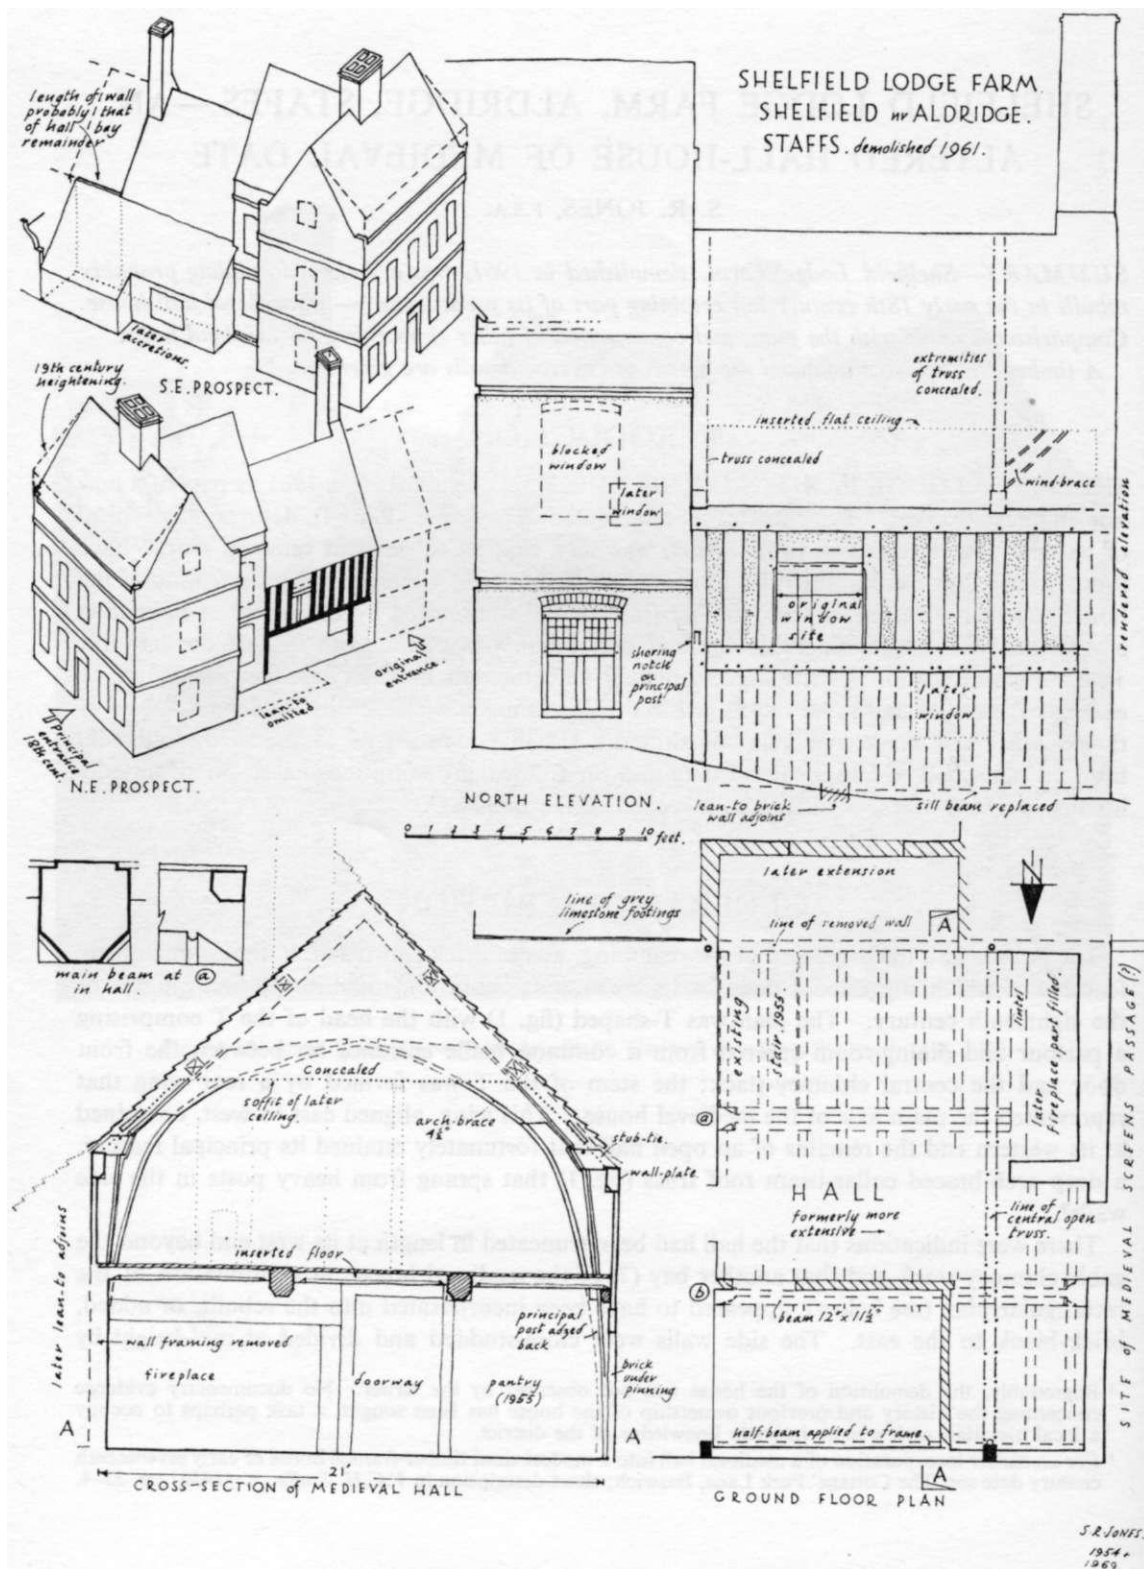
Shelfield Lodge Farm. Plan, cross-section and elevations
